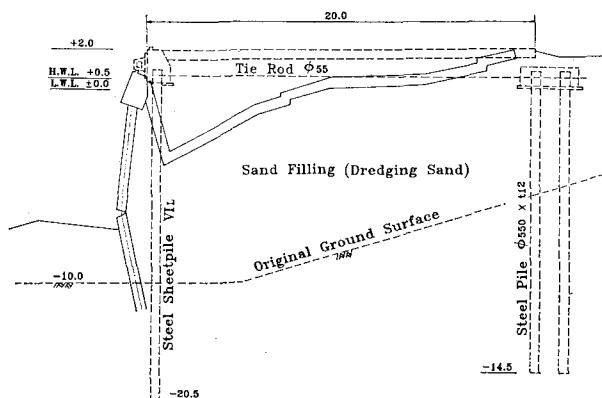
Cross Section of Sheetpile Bulkhead at Ohama No. 2 Pier in Akita Port
